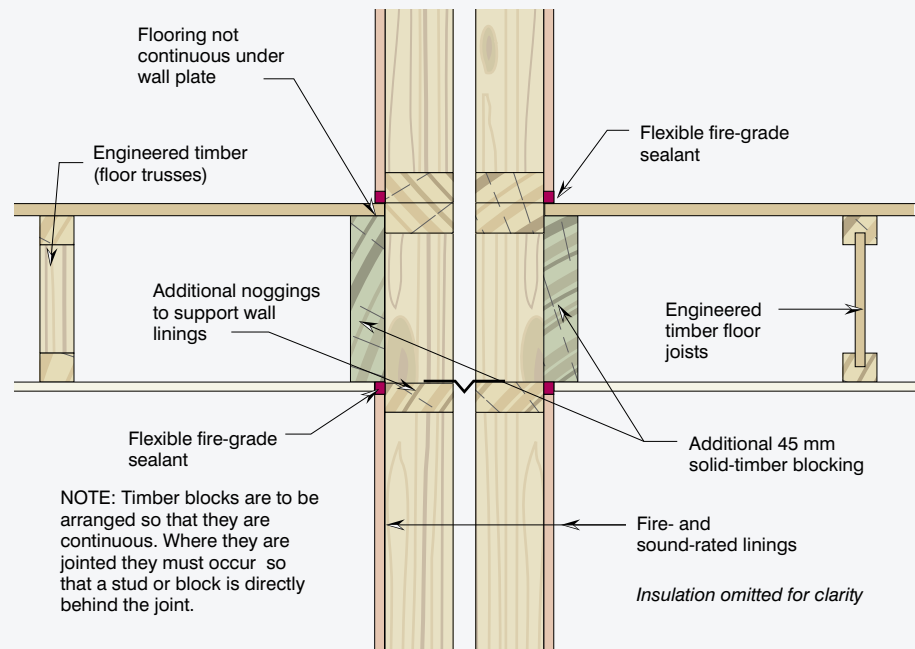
Wall stud continuous through the junction with timber blocks – elevation view.
